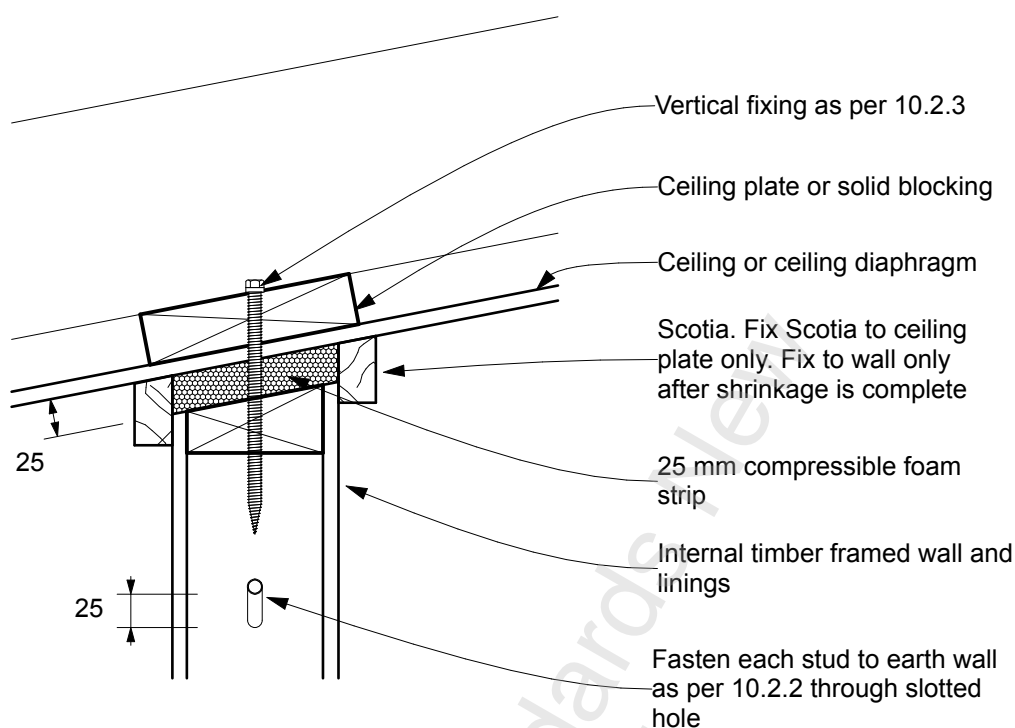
Non-loadbearing internal wall fixing to allow for shrinkage
